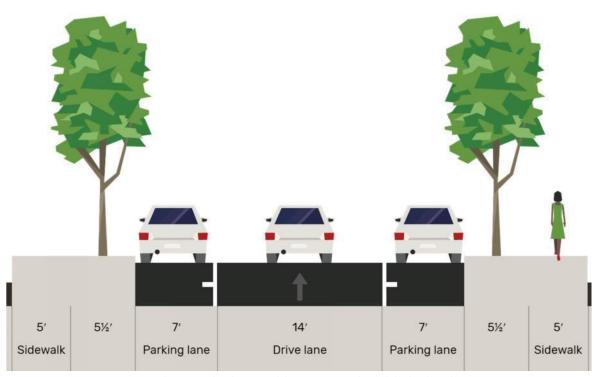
STRAUSS AVENUE CROSS-SECTION
